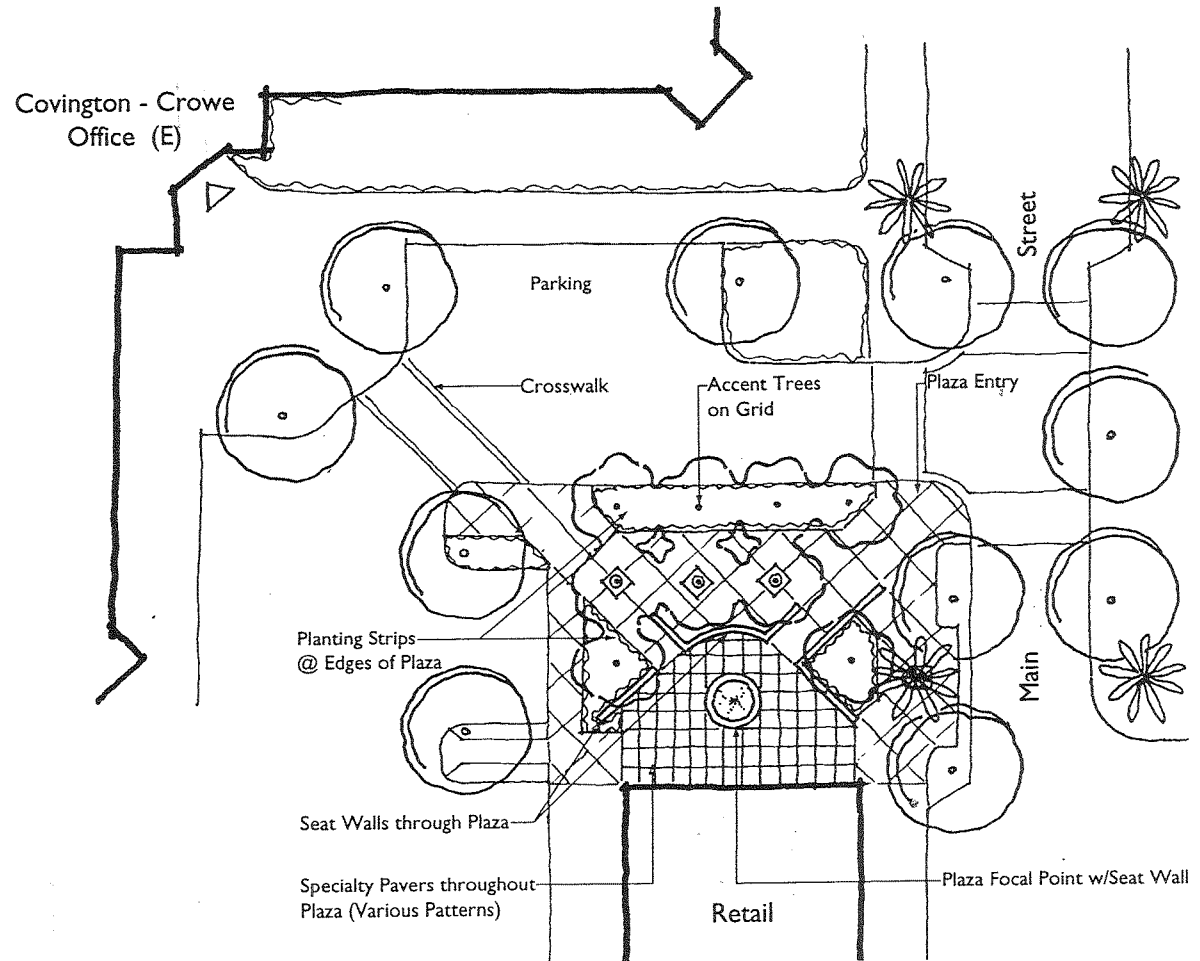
, Main Street Plaza located on the west side of Main Street. This small plaza will serve as a luncheon or rest area for the employees of the Covington-Crowe office building as well as Main Street patrons.
